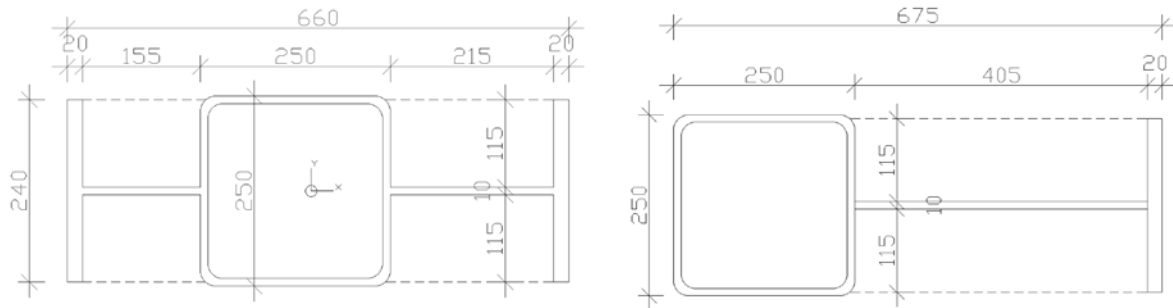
Cross-section of FUSEIS columns for system with (a) beam and (b) pin links (dimensions in mm)
